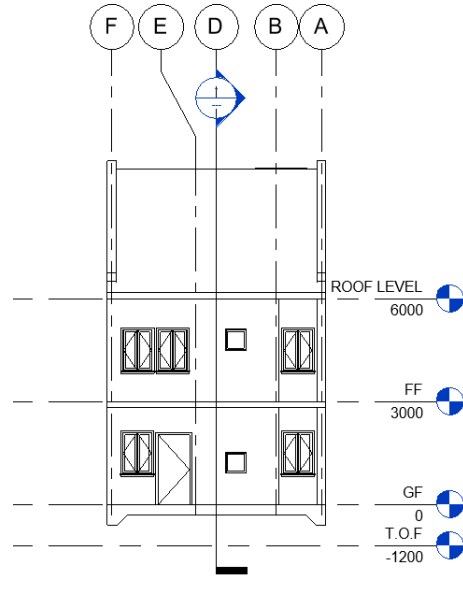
Model D: Casement window, single-leaf timber door and skylight.
